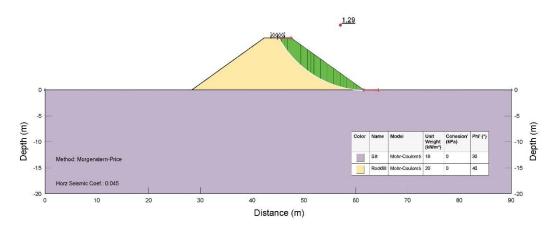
Slope stability of rockfill embankment over silt, 10 m fill, with a horizontal seismic coefficient of 0.045.
